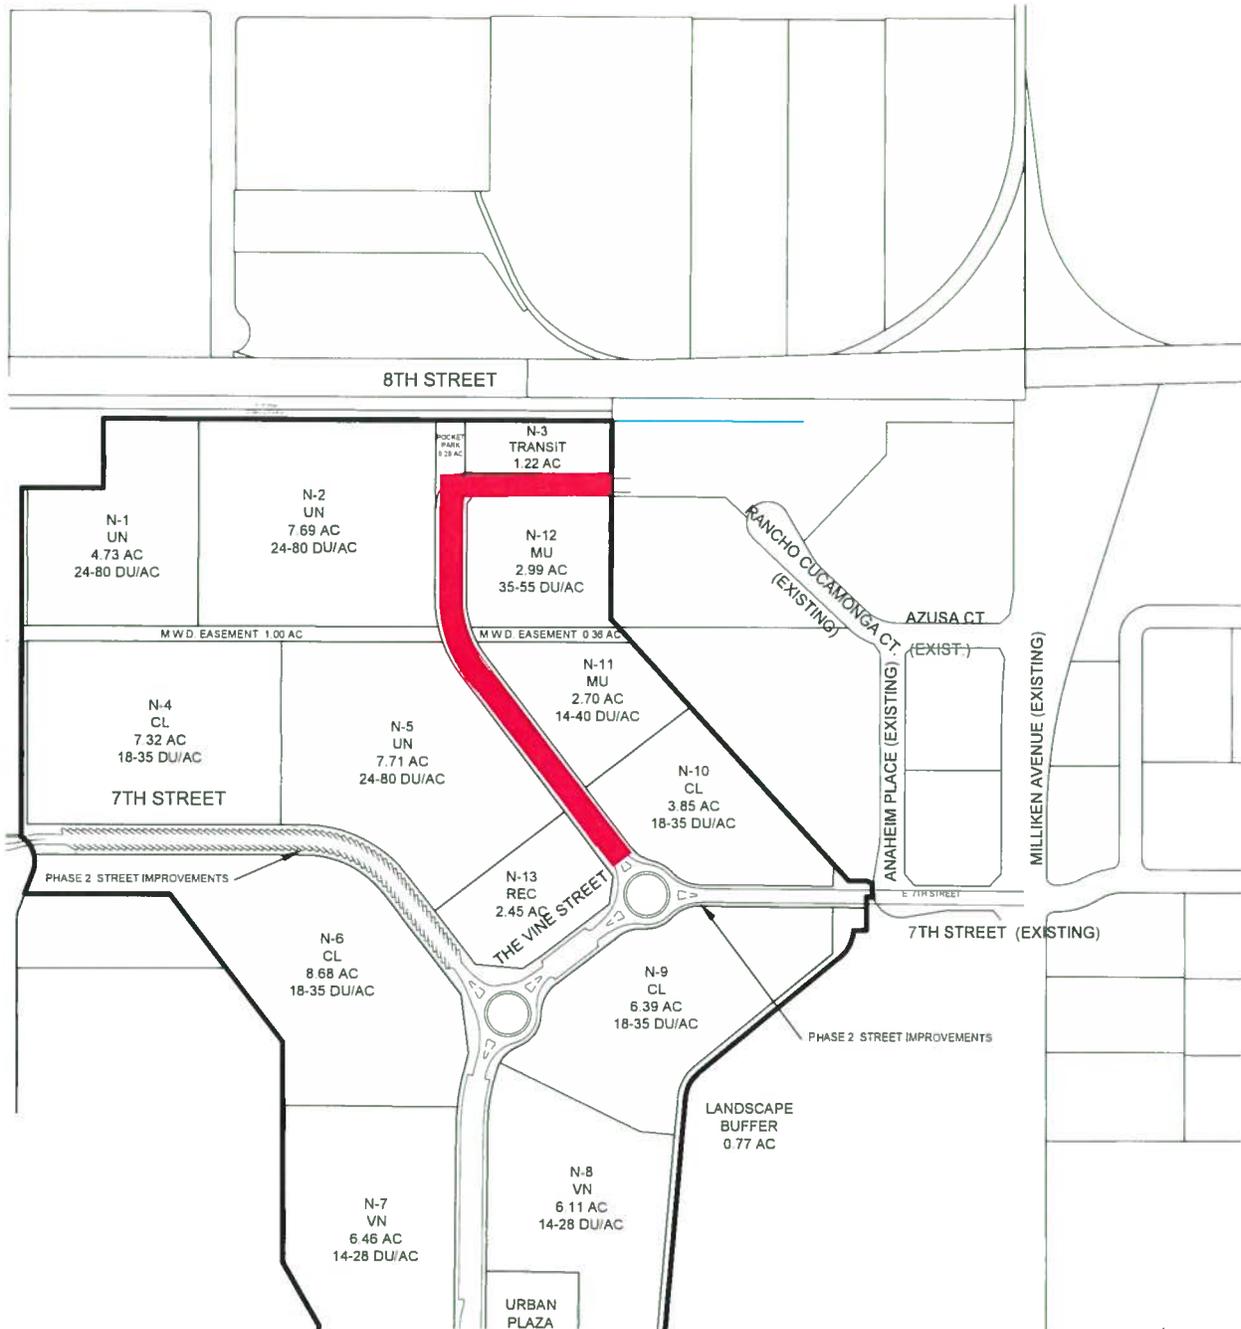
Conceptual Phase 3 Street Improvement Facilities Plan
